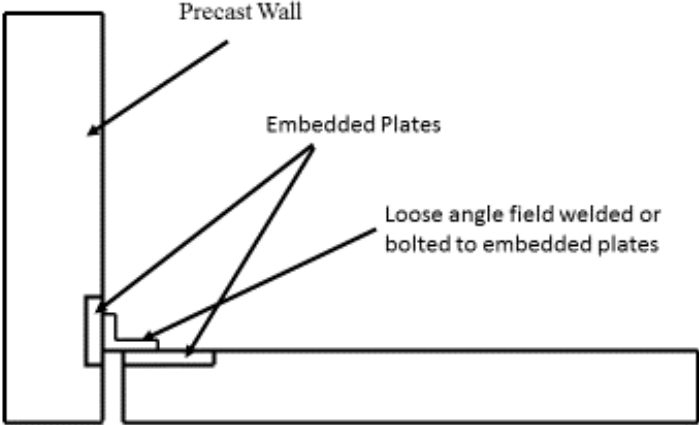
Typical Clip Angle Precast Wall Connection (Adapted from The Constructor 2014)
